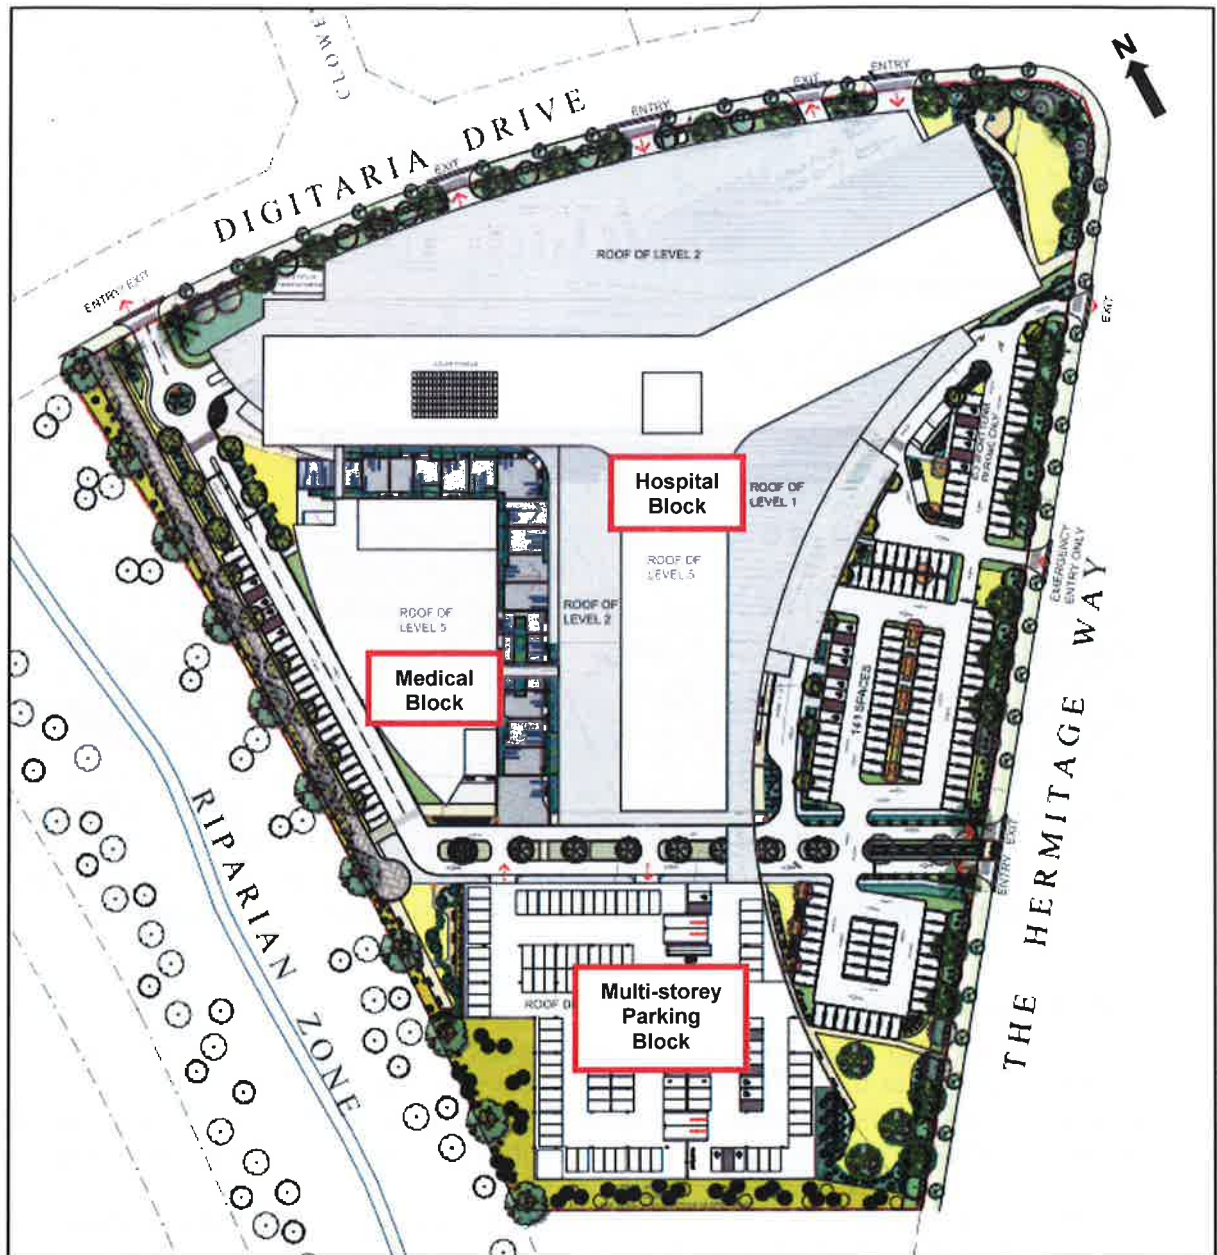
Proposed Concept Site Layout Plan (Source: Applicant's EIS)
